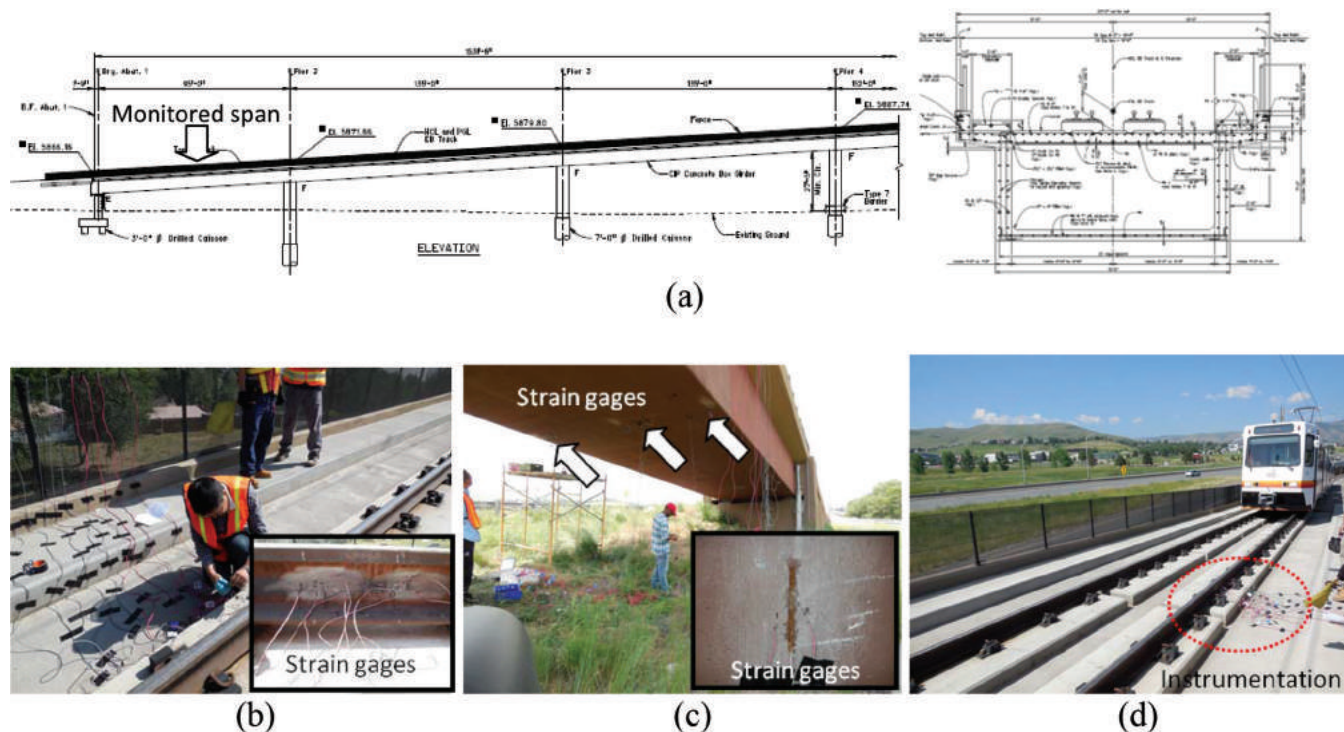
Instrumentation for rail and superstructure responses (Indiana Bridge): (a) elevation view and typical cross section of girder; (b) rail gauge bonding; (c) girder gauges; and (d) one-way train track.
